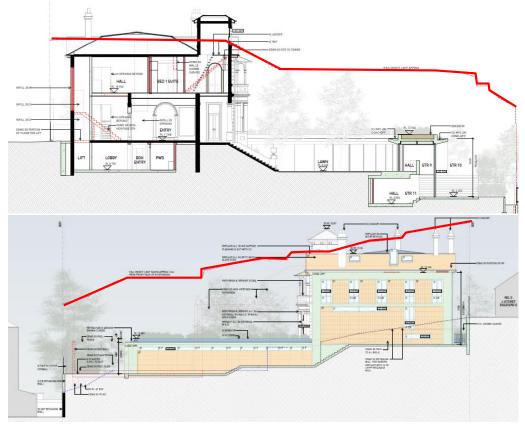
Section through existing dwelling and tower (top) and western elevation (below) demonstrating works above the 9.5m height line in red.
